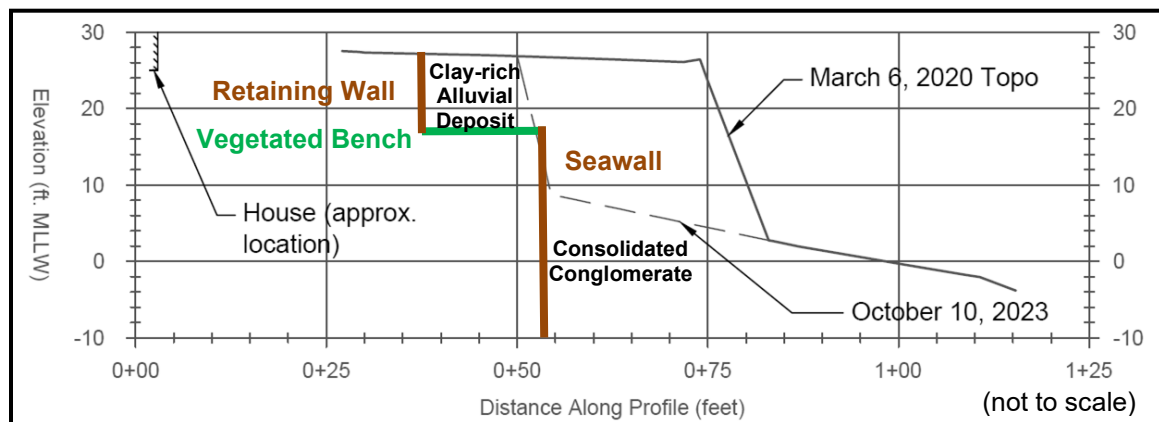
Concept for full height terraced seawall and retaining wall(s) alternative
